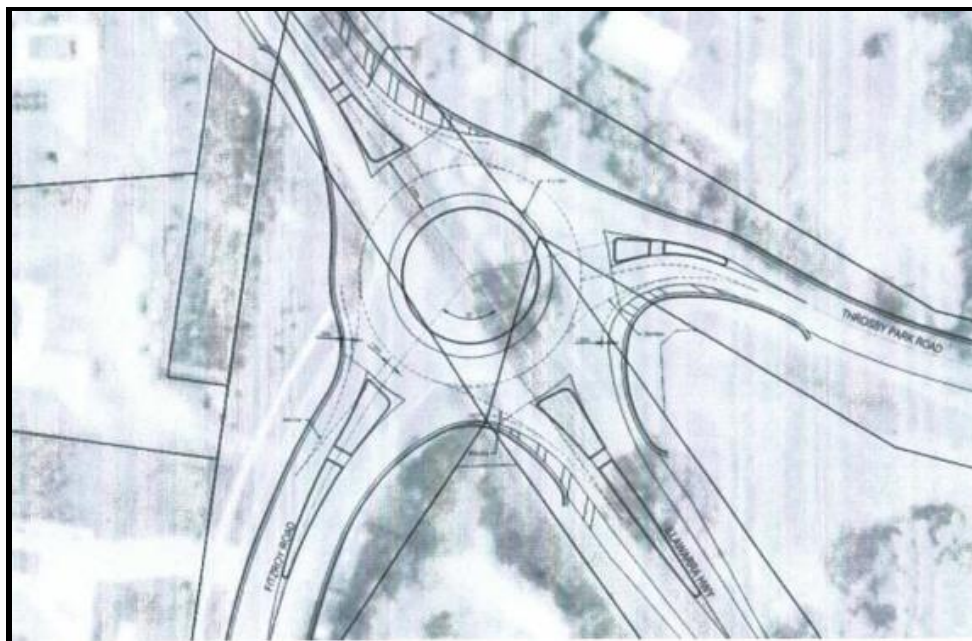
Intersection Upgrade Work (Source: Annexure A of SVPA executed on 17 July 2021)
